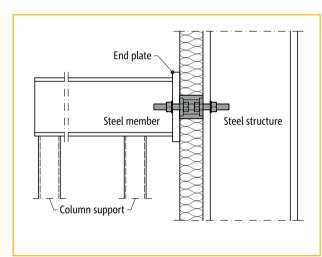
Schöck Isokorb® type S22 for restrained steel structures
